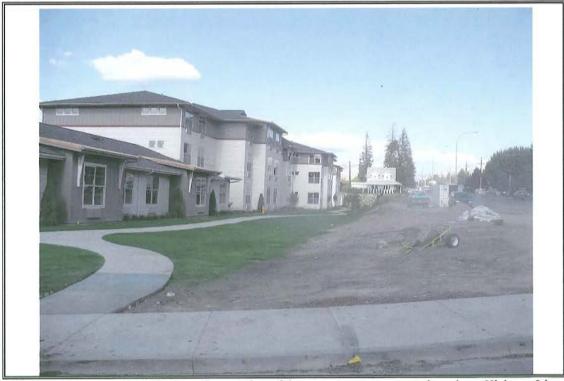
Photograph Number 8: This photo shows a view of the northeast corner of the property and the amount of excavation that occurred at this location on the site.
